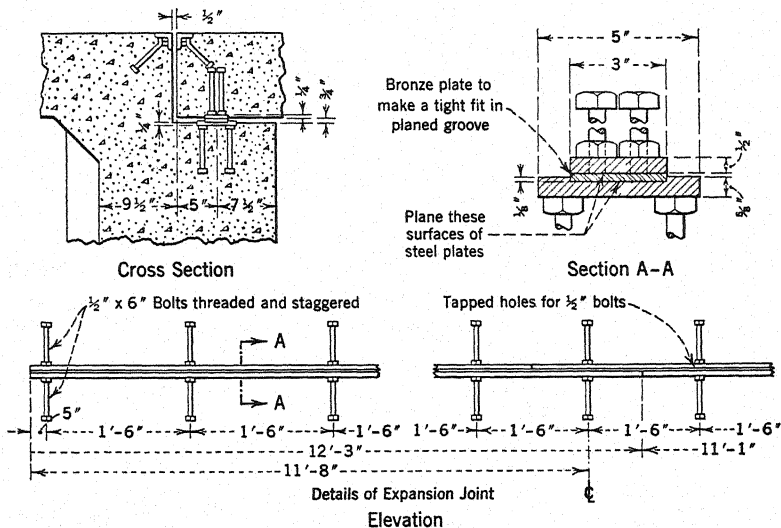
Expansion Joint and Bearing, Truckee River Bridge. (See p. 378.)
